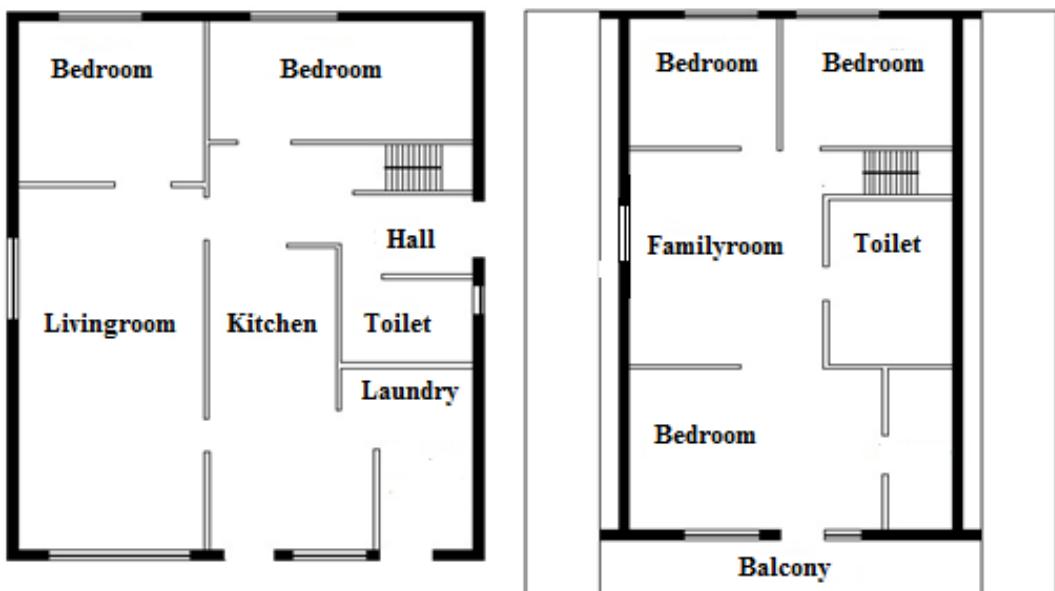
Ground floor plan &amp; First floor plan of Villa katrineholm
